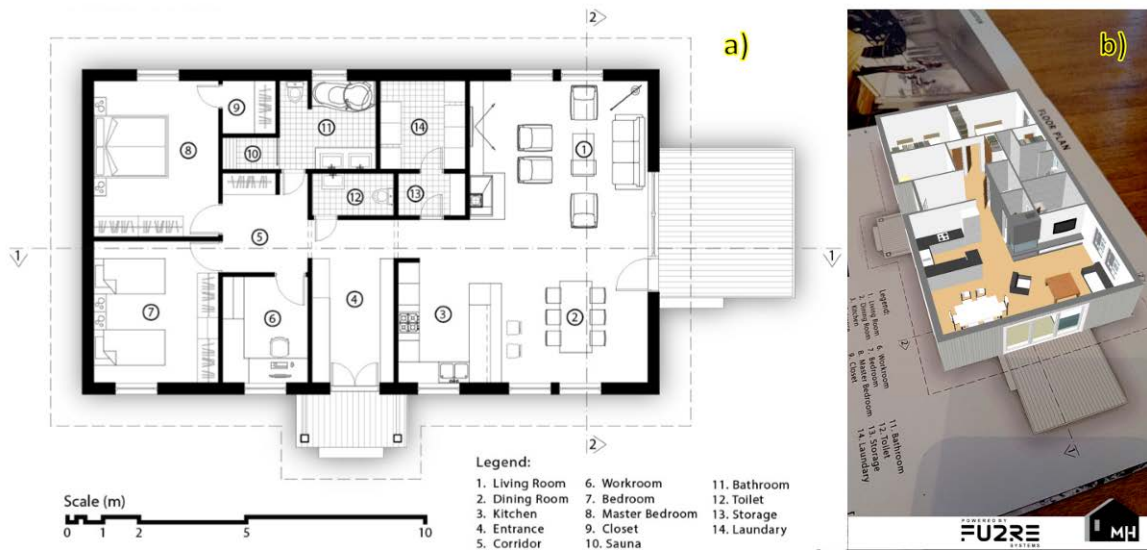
MH Petra: a) Floor plan (marker); b) Augmented Reality presentation of detail floor plan 3D model
